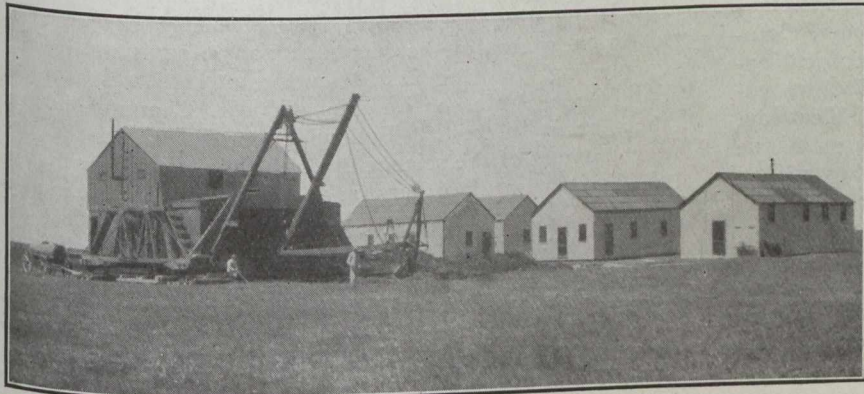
Gasoline-operated Walking Dredge Engaged in Trench Excavation.
